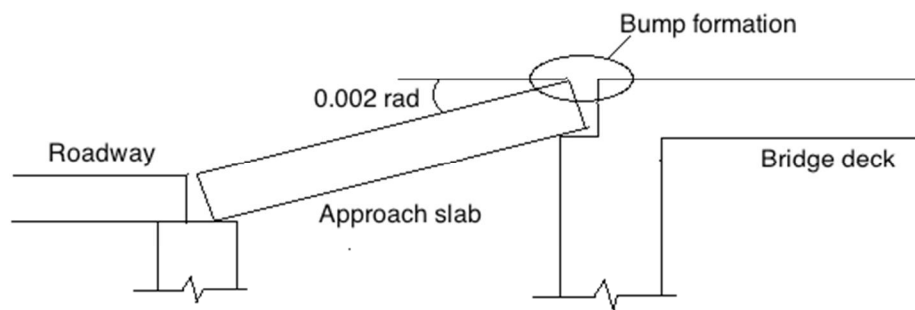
Bridge Approach Slab with Differential Settlement of Soil
